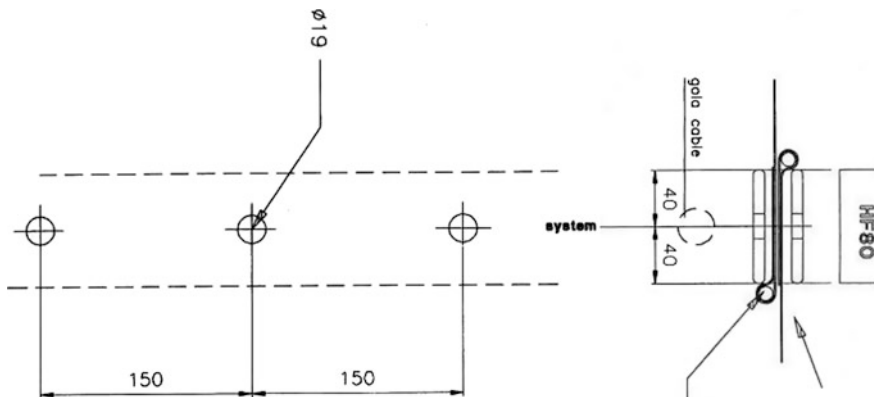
Clamping joint (Source Courtesy formTL)
